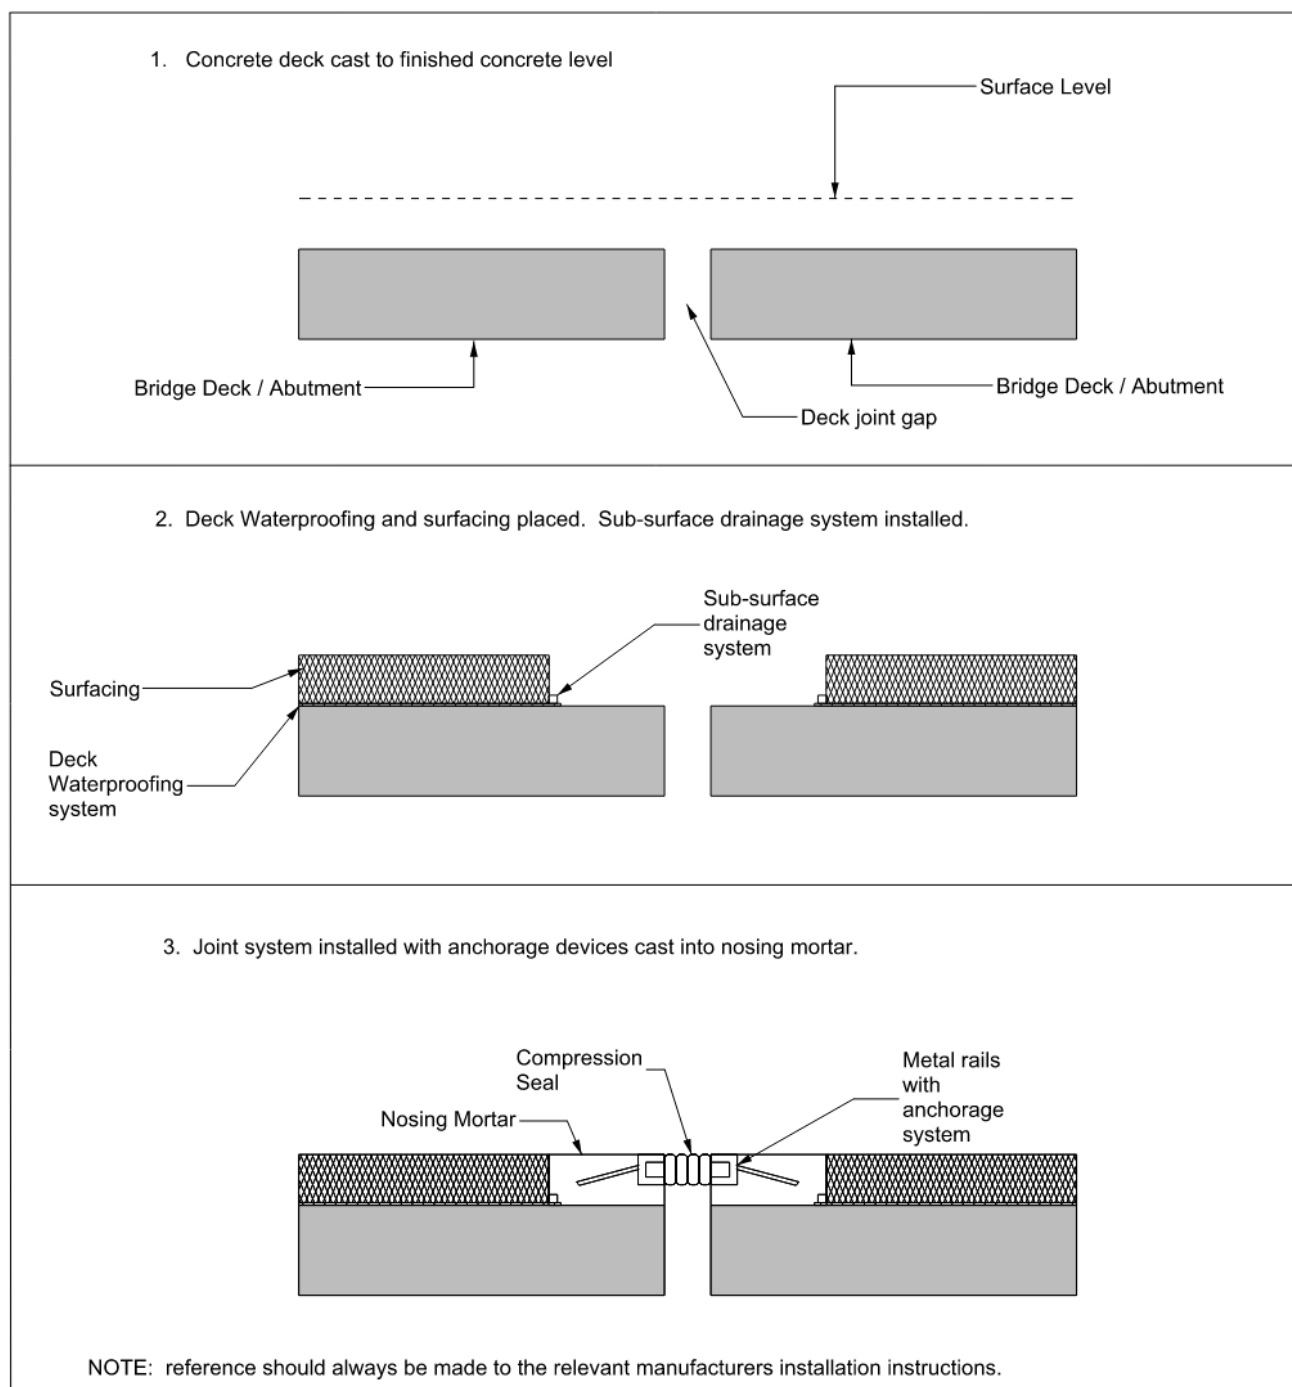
Typical installation procedure for surface mounted joint attached to deck using nosing mortar (single element modular joint shown)
